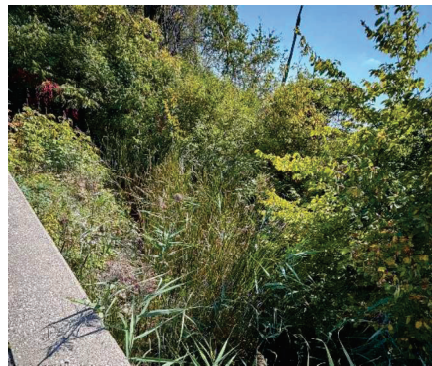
Culvert outlet of Crossing 6, north side of County Road 46.
